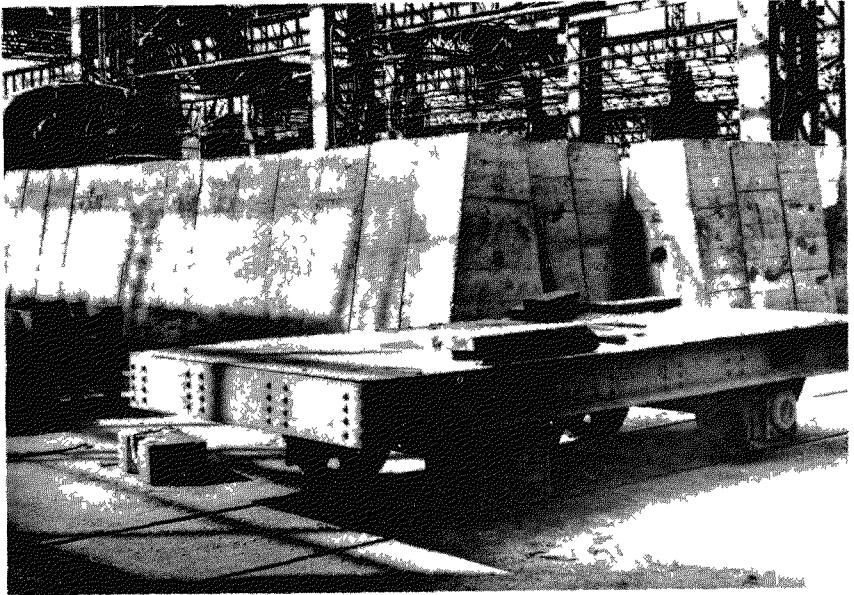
Precast, reinforced-concrete blast walls (0.85 mile from ground zero at Nagasaki).
